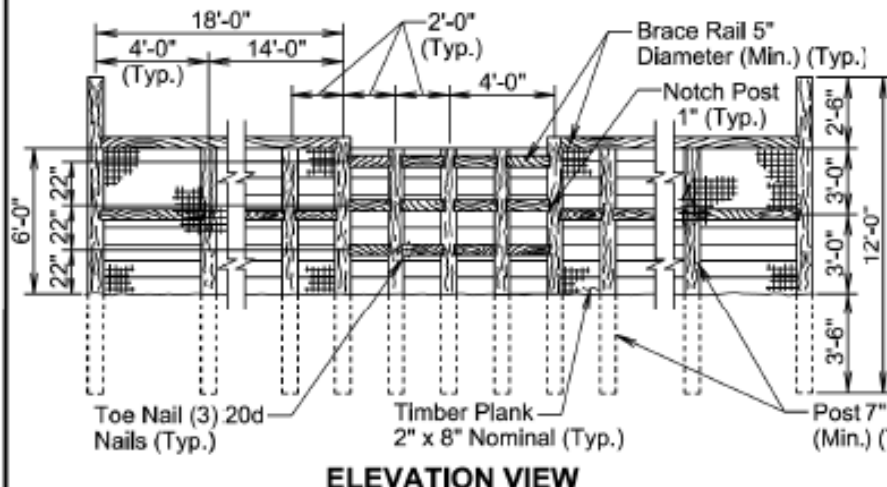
DETAILS FOR FENCE ANCHOR (STANDARD WINGWALL)
